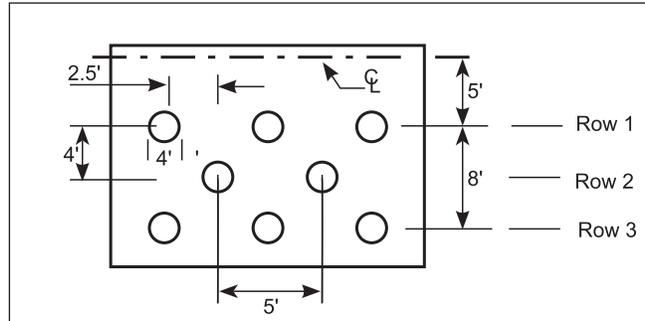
Grout Hole Layout (Pattern is on the Downstream Side of Dam Centerline)
